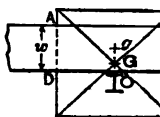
Square Supporting Area. Wall and Eccentric Isolated Load
